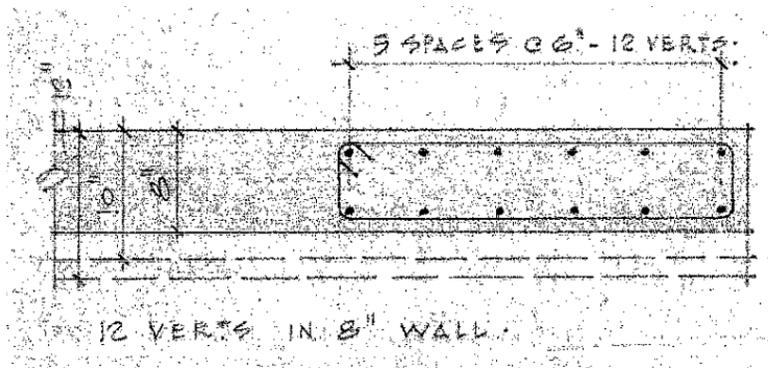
Walter H. Gage Residence typical section through main shear wall at first few floors of the building from the record structural drawings
